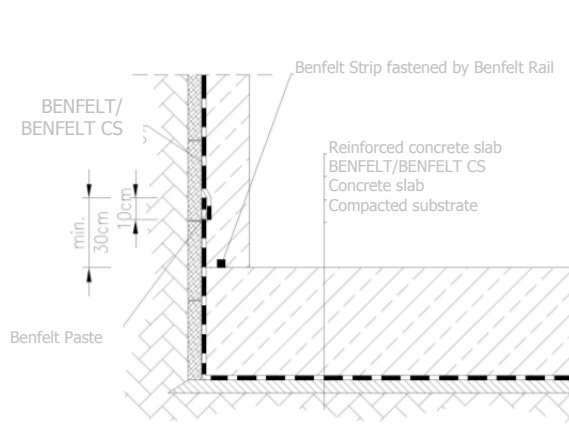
Passage of the horizontal insulation onto the fixed excavation cover development.
